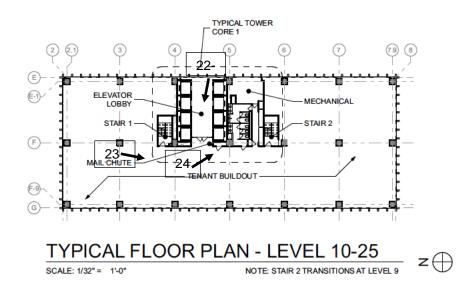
Photo Location Map showing the shell and core of floors ten through twenty-five of the Financial Center Office Building, Des Moines, Iowa. (Slingshot Architecture).
